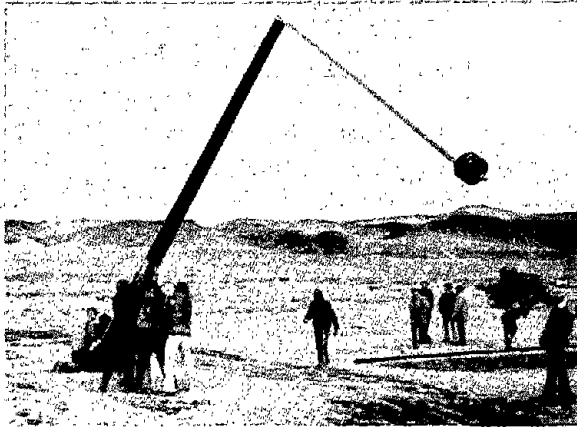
Light standard being lifted into place without the aid of heavy equipment.
